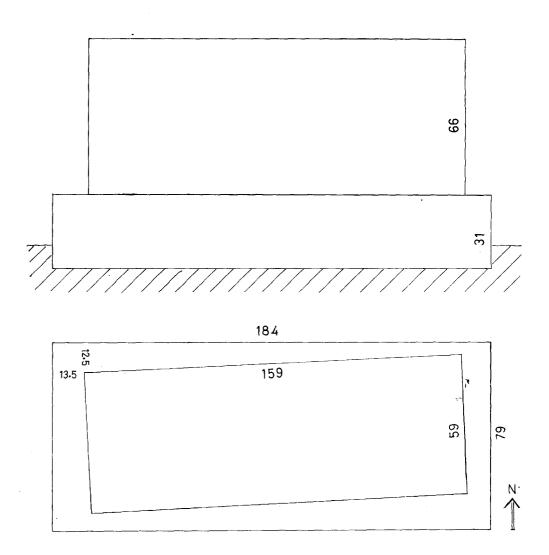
Tombstone in Khosrova cemetery. Ground plan and elevation. Dimensions are given in cm.
